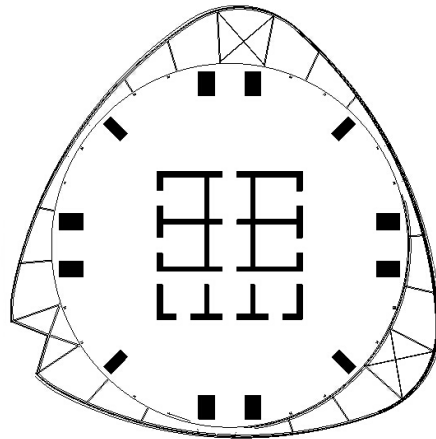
Typical layout plan of Shanghai Tower (Source: Guangjing Sha)
